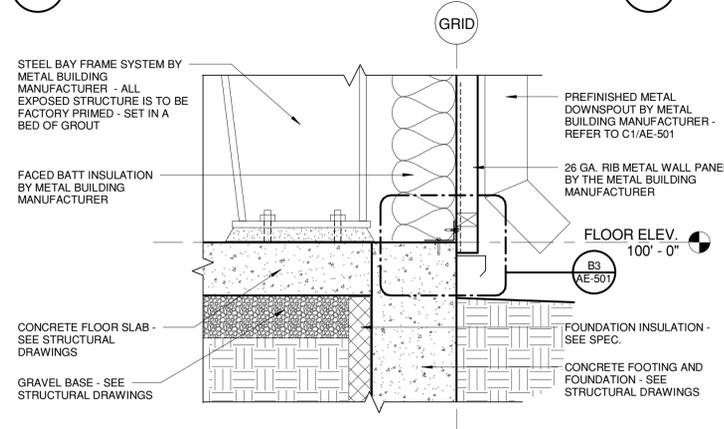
DETAILING INDICATED TO SHOW GENERAL DESIGN INTENT FINAL SPECIFIC DETAILING & DESIGN TO BE SUBMITTED BY THE METAL BUILDING MANUFACTURE.
